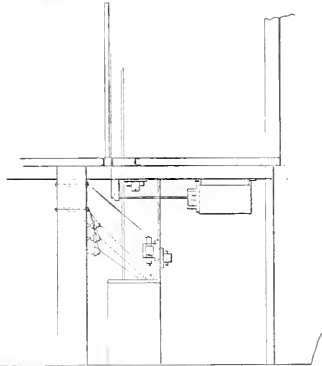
CROSS-SECTIONAL ELEVATIONS OF CELL ROOMS.
